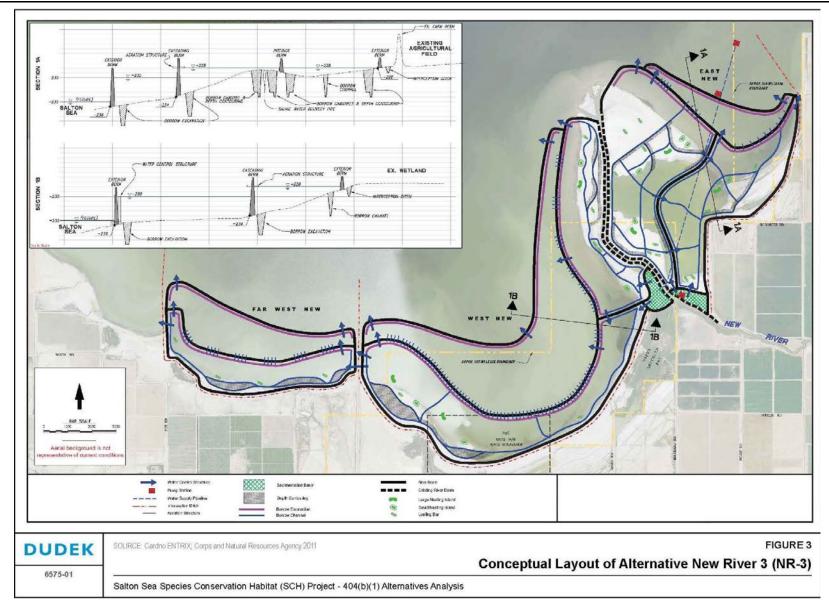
Conceptual Layout of Alternative New River 3 (NR-3)
